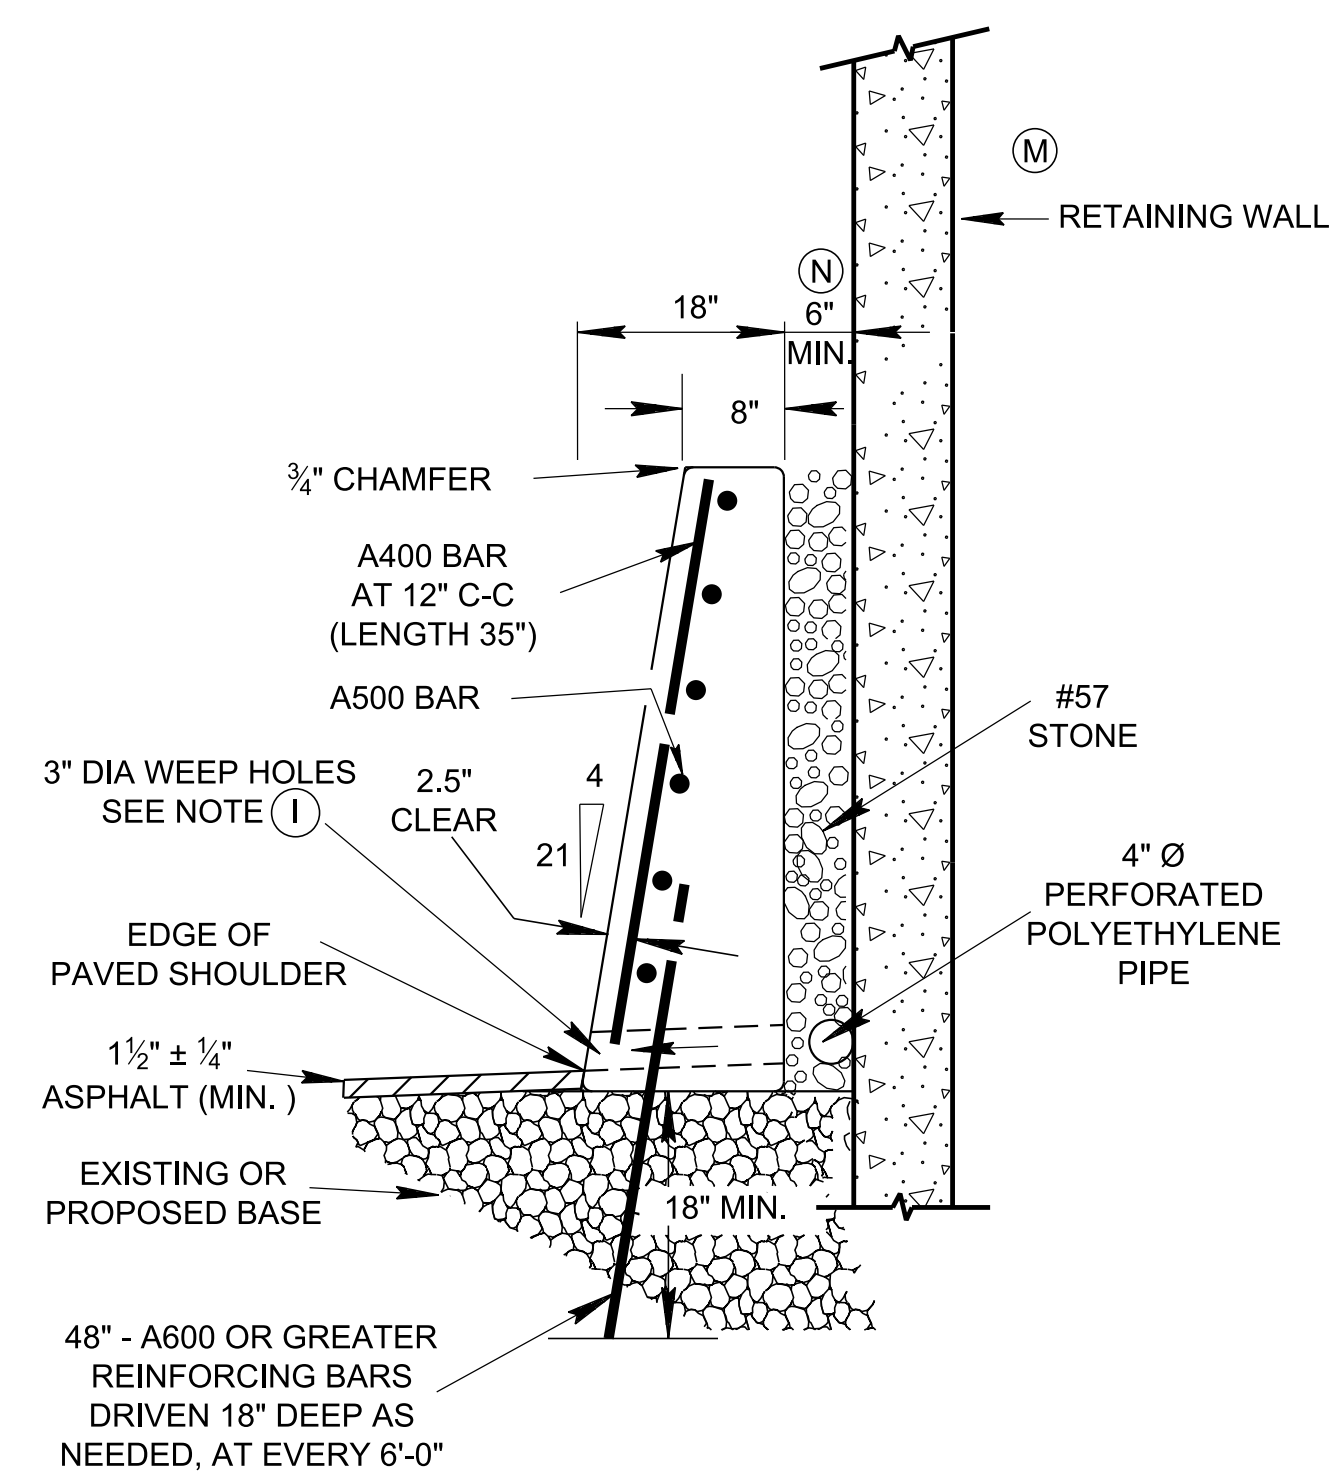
DETAILS OF REINFORCING AT WALL ENDS OR EXPANSION JOINT FOR CONCRETE BARRIER
